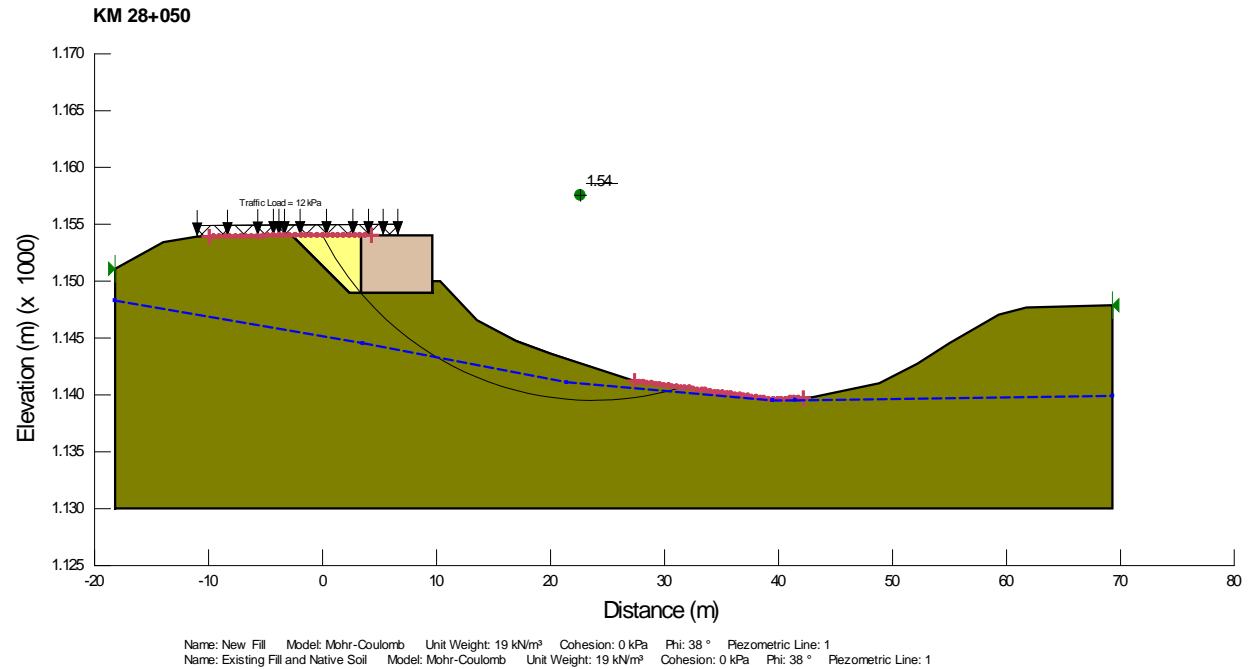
Station 28+050- Global Stability of the Slope after Construction of the Retaining Wall (Retaining Wall Height - 5.0 m, Wall Embedment below Finish Grade - 1.0 m, Reinforcement Length - 6.3 m)
